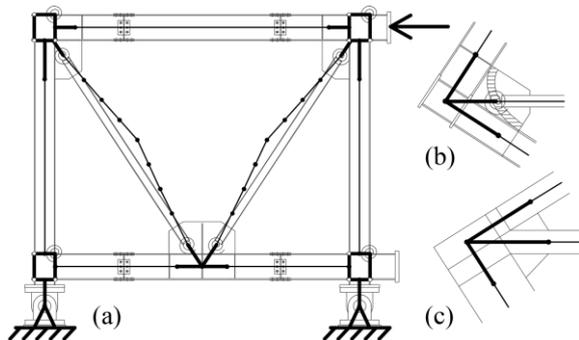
Models: (a) Specimen by Seki et al. [4]; (b) Flexible bracing connection; and (c) Rigid bracing connection.
